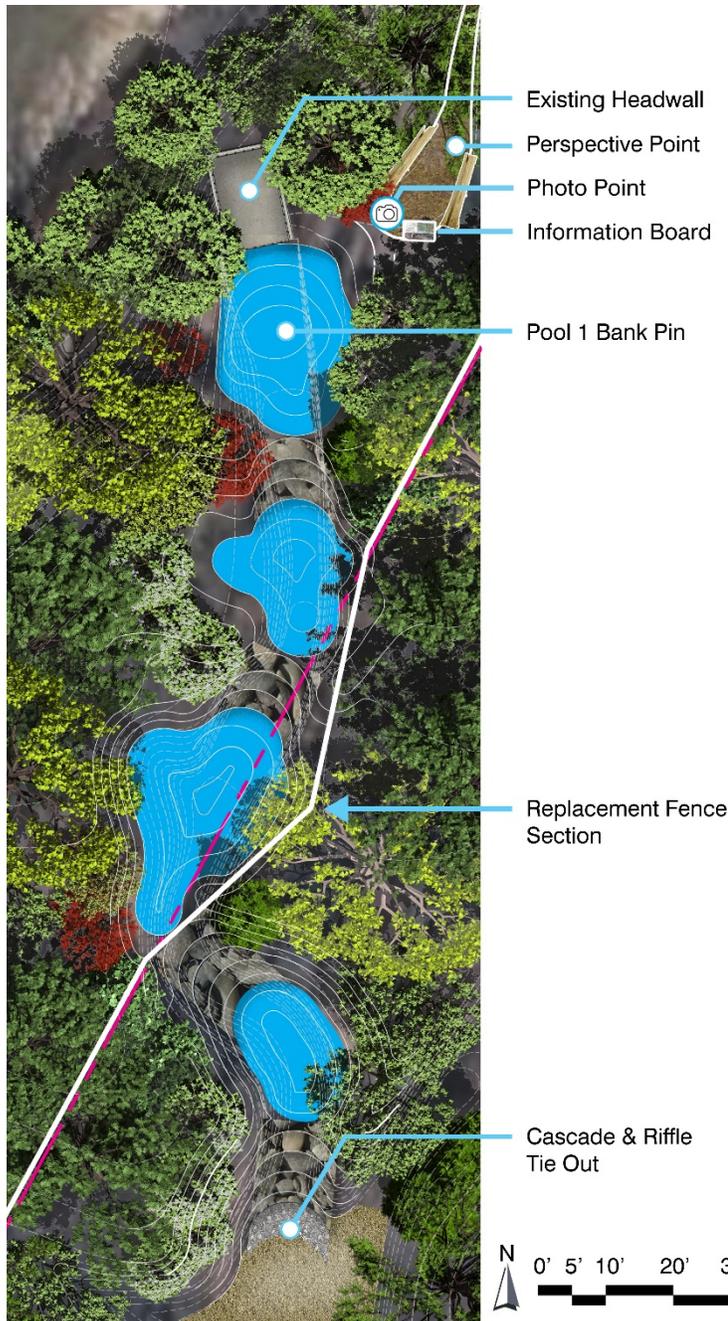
The illustrative plan for the Parkdale High School RSC
